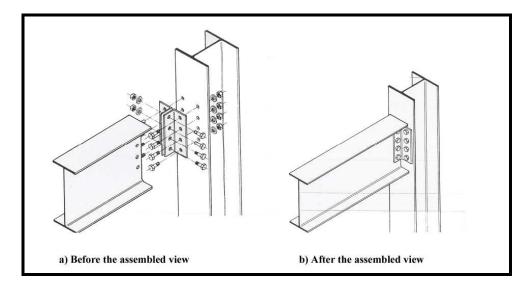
Exploded and assembled views of a framed, bolted beam to column flange connection, the size of the angles and the number of the bolts are decided by the magnitude of the load that the connection should transmit from beam to column (Allen, 1999:362).
